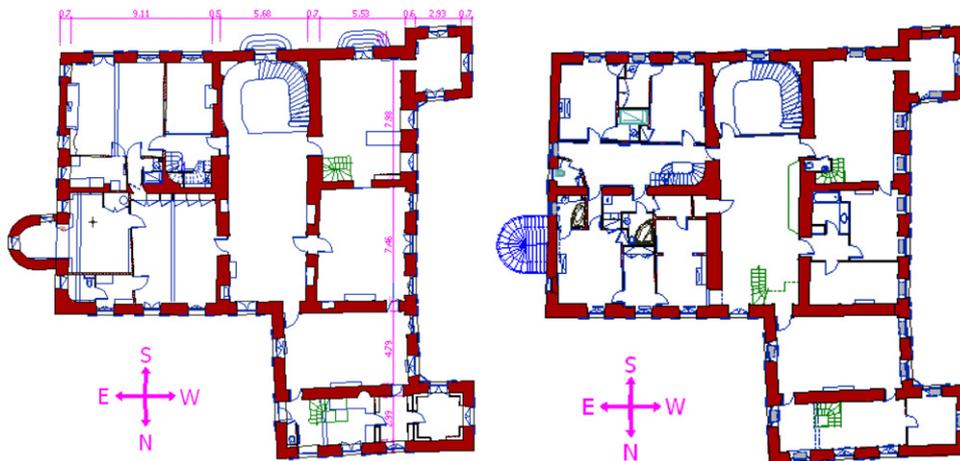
Plan of the first (left) and second (right) levels of the Lavort chateau.
